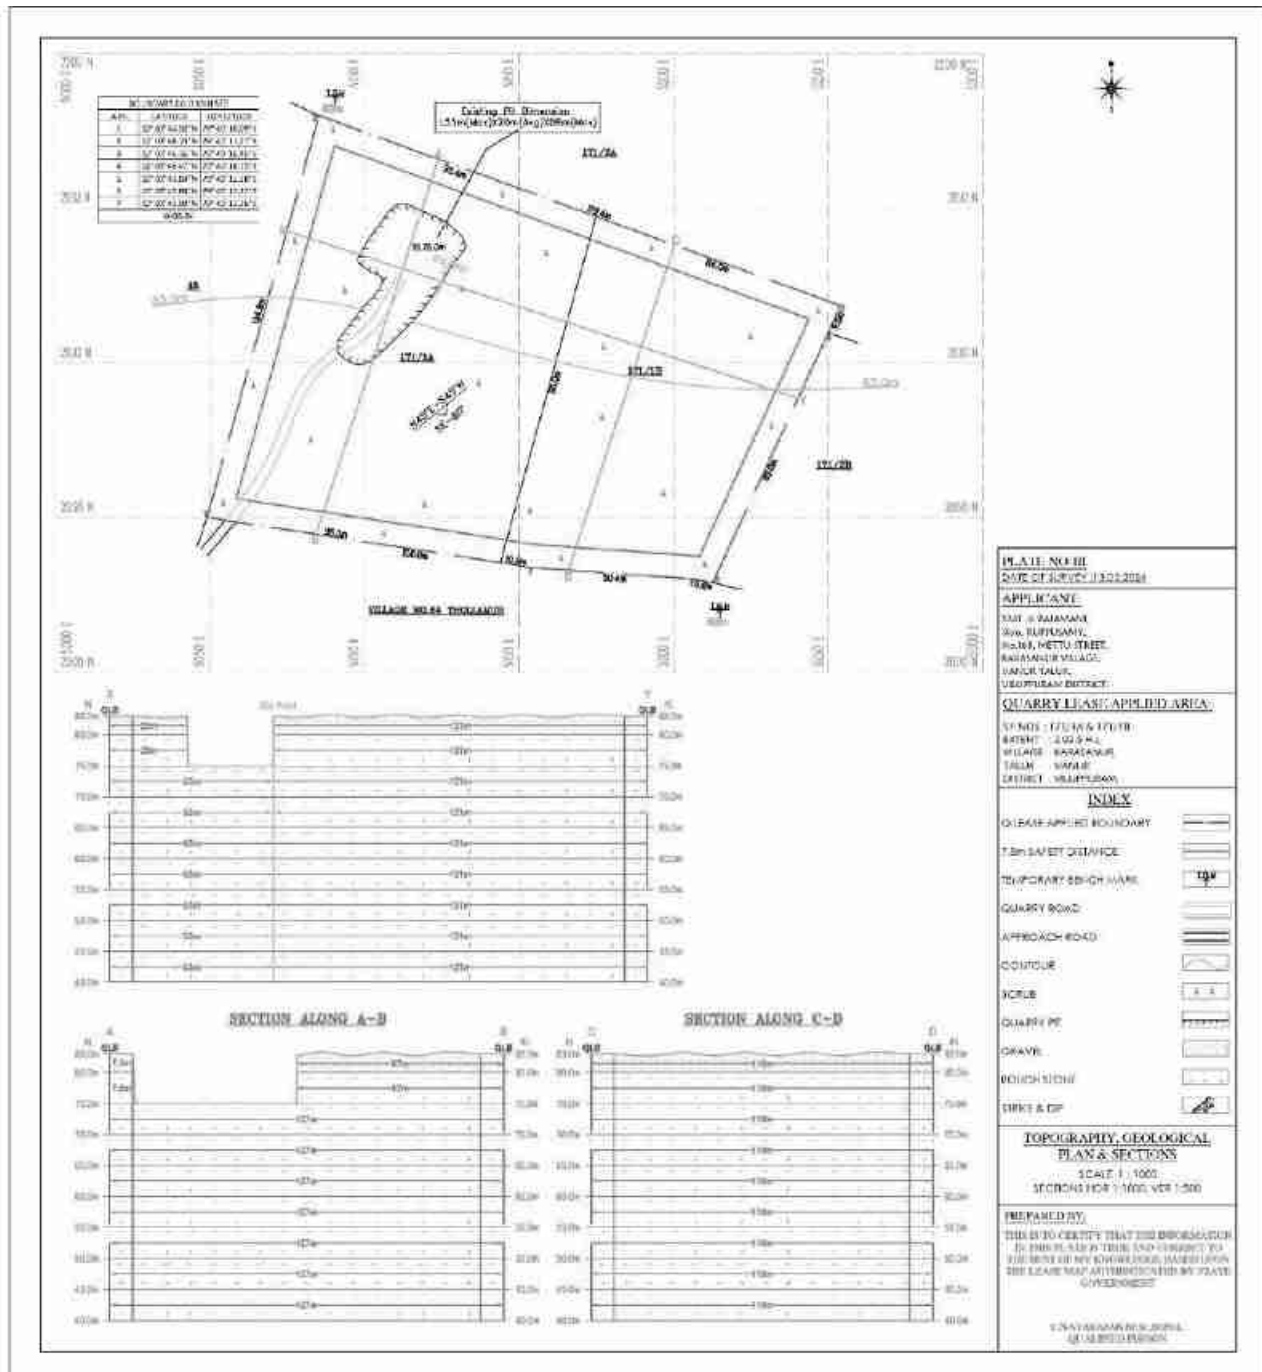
SURFACE PLAN PROJECT SITE
